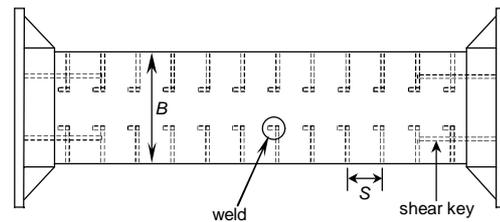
The schematic diagram of Specimen SS-70 (B/3, #3)
